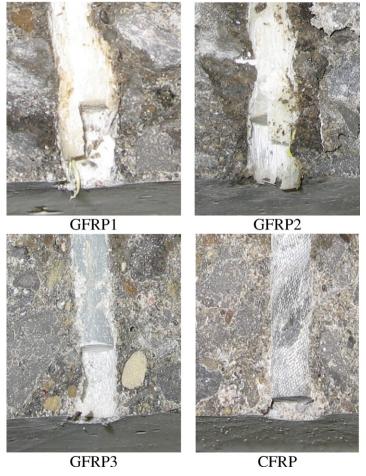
Typical FRP-surface bond failure modes of pullout tests.
